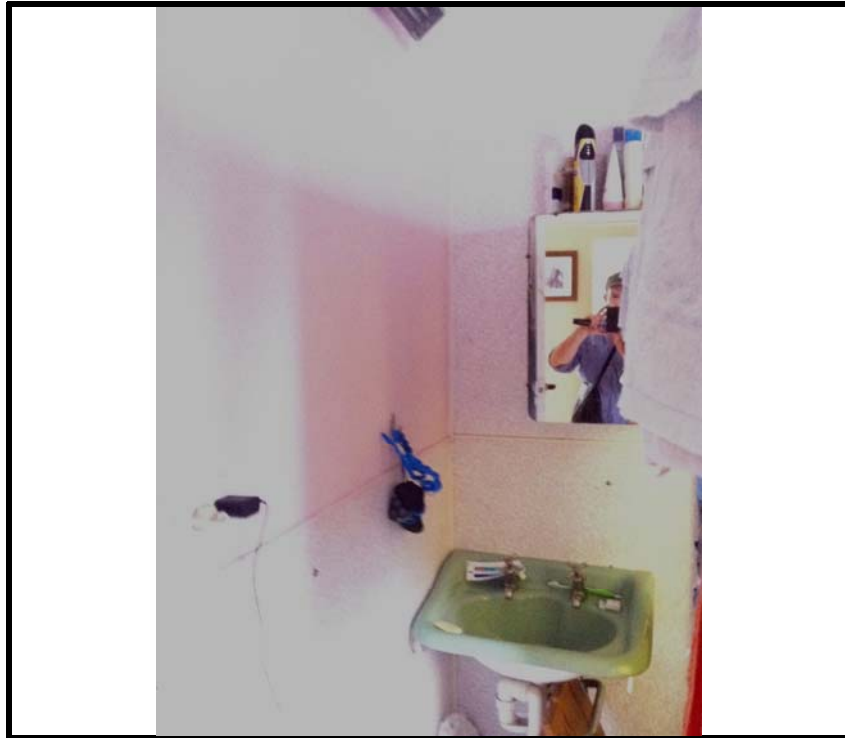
ACM sheeting used in pattern sections of walls to the bathroom at 5 McLeod Road.
